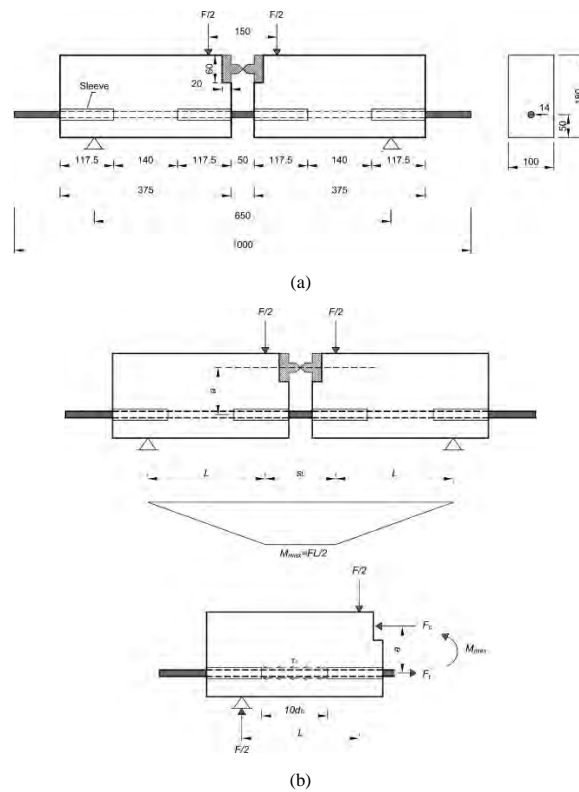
(a) Beam test specimen detail for $d_b=14$ mm (b) load transfer mechanism [31]
